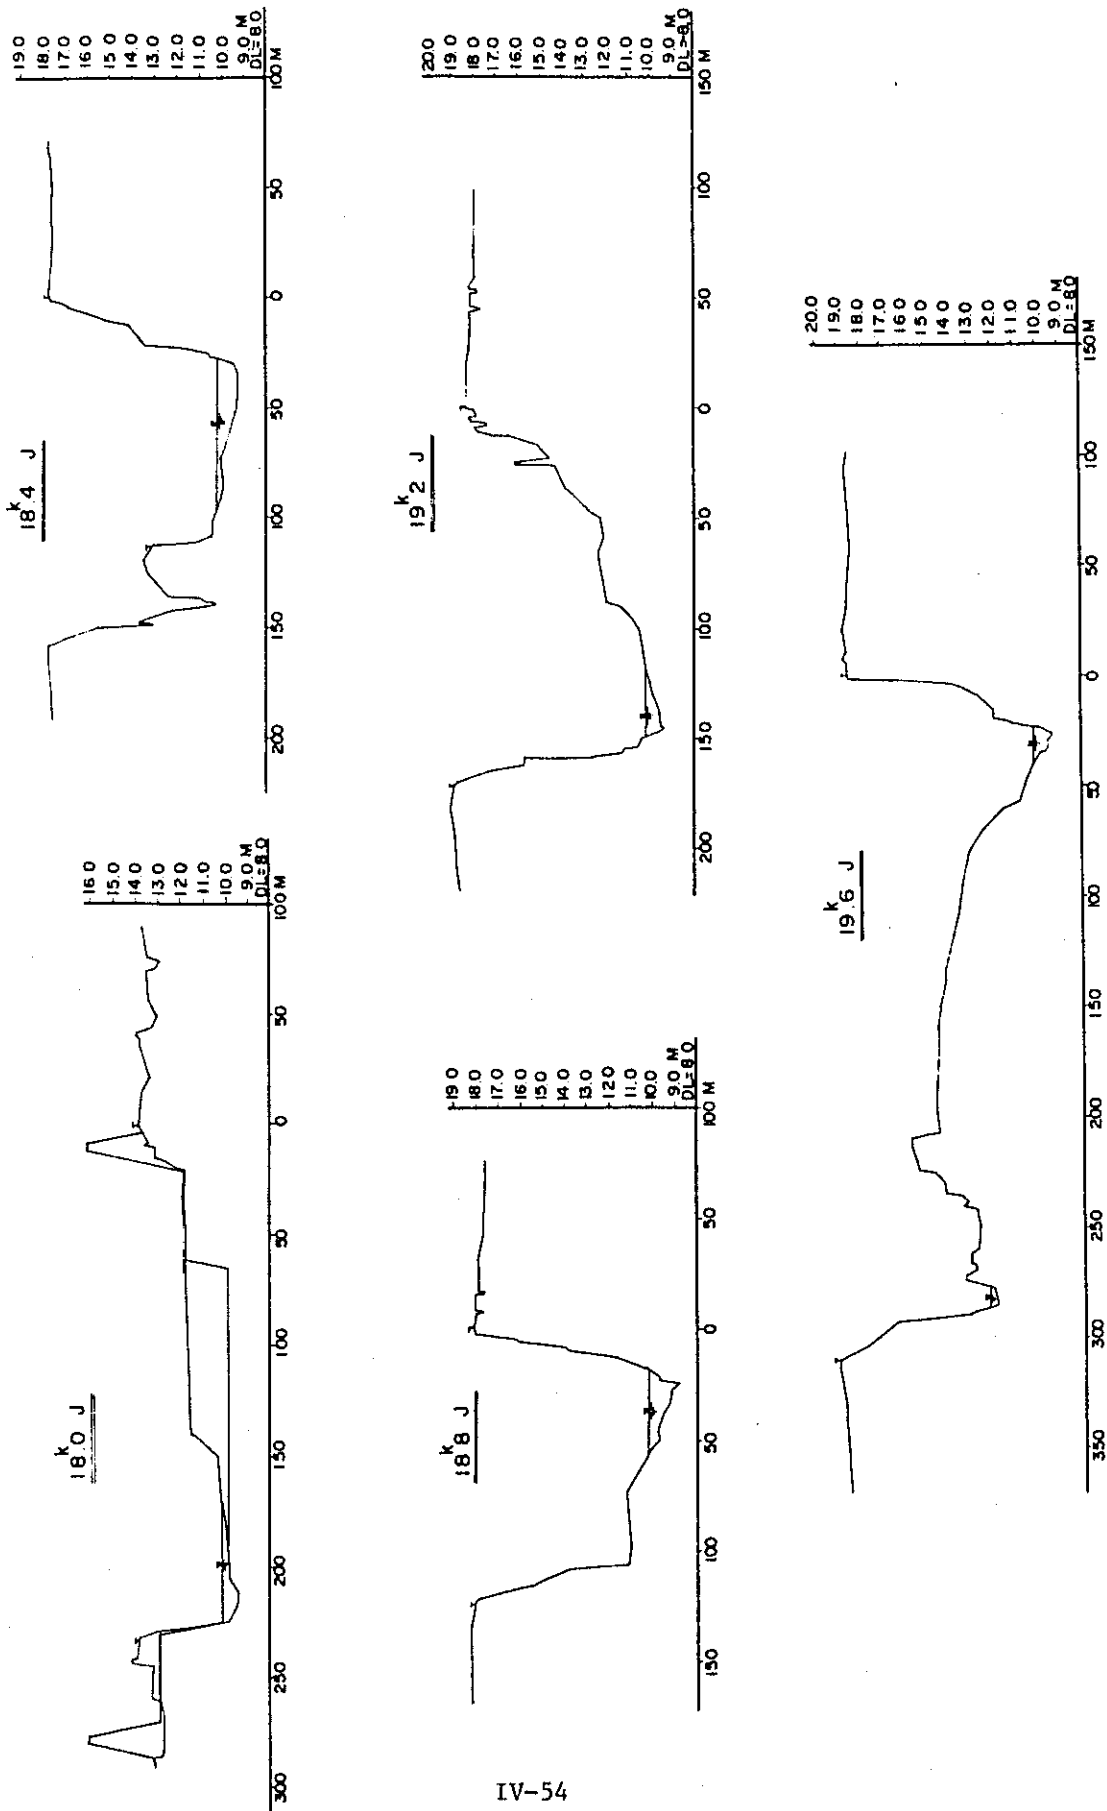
(10) PROPOSED CROSS-SECTIONS FOR OVERALL PLAN
